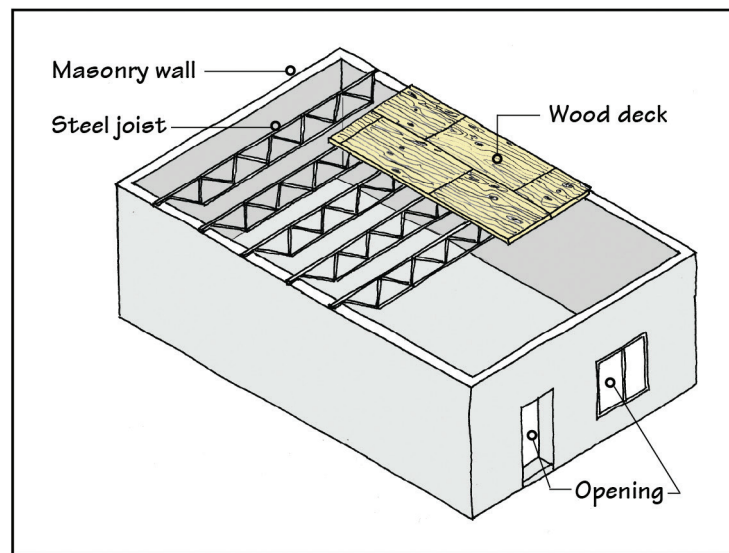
A simple load-bearing masonry wall building with steel roof joists and wood roof deck, used as an aid to recalling the sequence of first few divisions of the MasterFormat.
